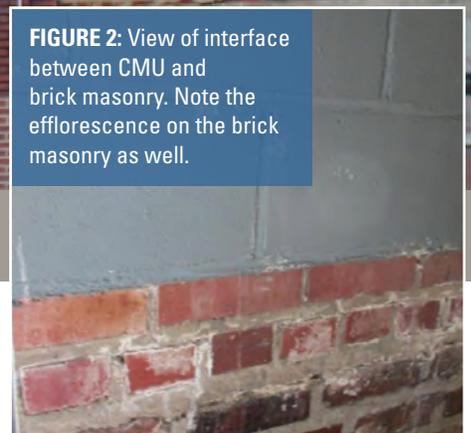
View of interface between CMU and brick masonry. Note the efflorescence on the brick masonry as well.
